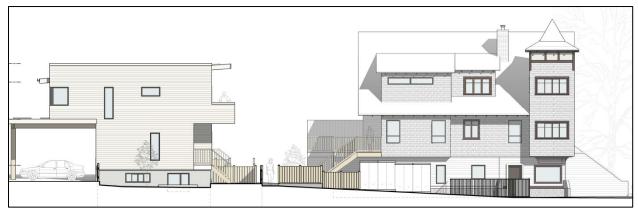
Western elevation view of the proposed alterations to 328 W 14th Street, 2021, including its back extension as well as the infill development at the back of the lot. (Source: METRIC Architecture)
